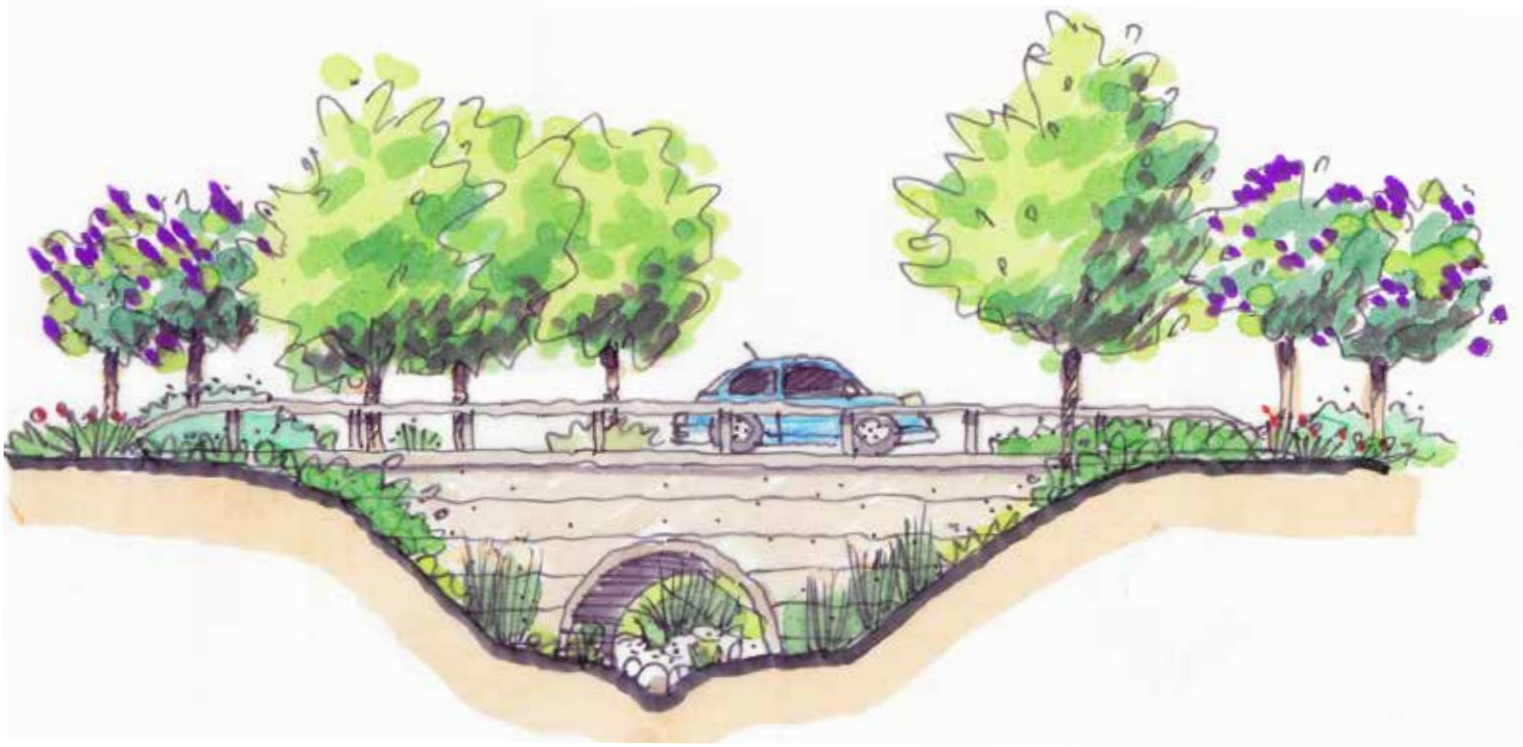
Existing culvert under parking and access drive compromises approximately 100 feet of Lafayette Creek. (N.T.S.)
